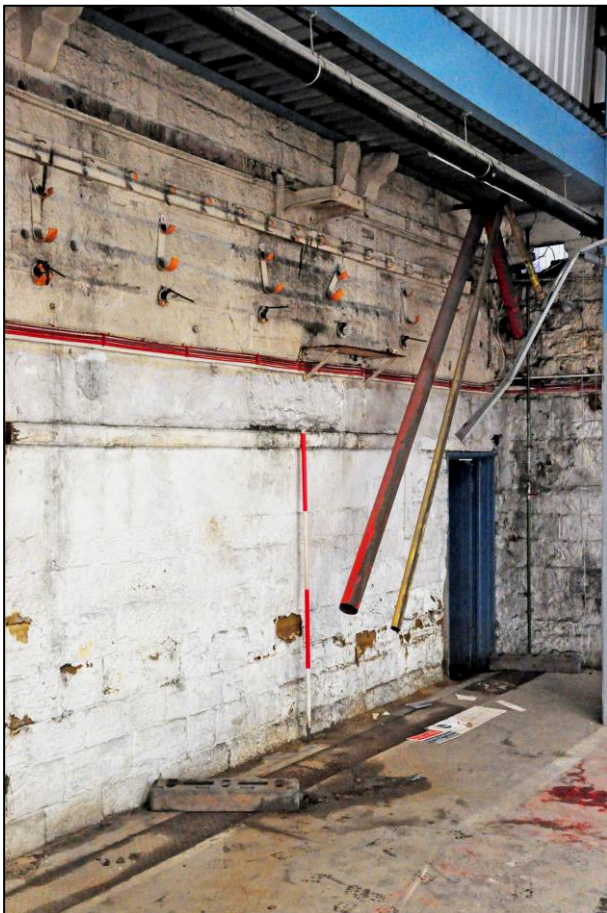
Weaving shed (Unit C), west end of south wall, showing ashlar course, looking SW (photo 11694).
